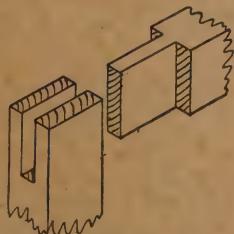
Mortise-and-tenon Joint for Door Frames
